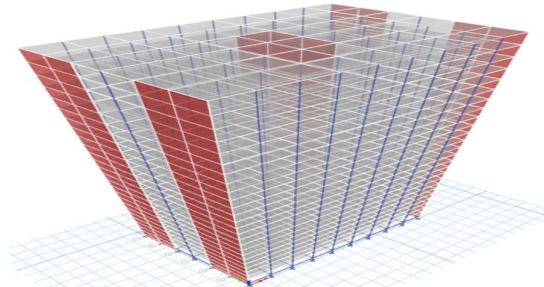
3D View of Bare frame model with shear wall along-Y and core wall at center
